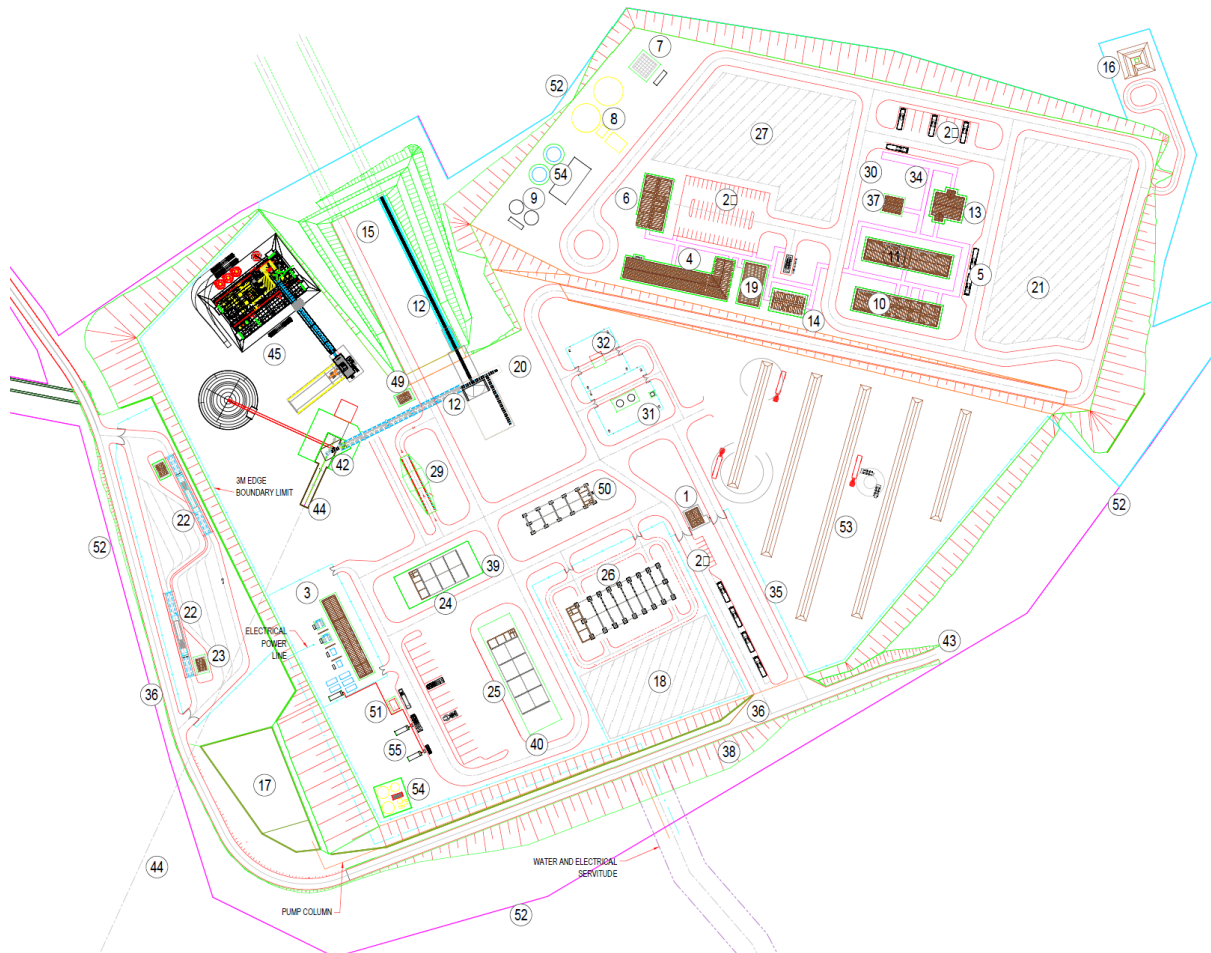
Proposed Layout of Surface Mining Infrastructure
